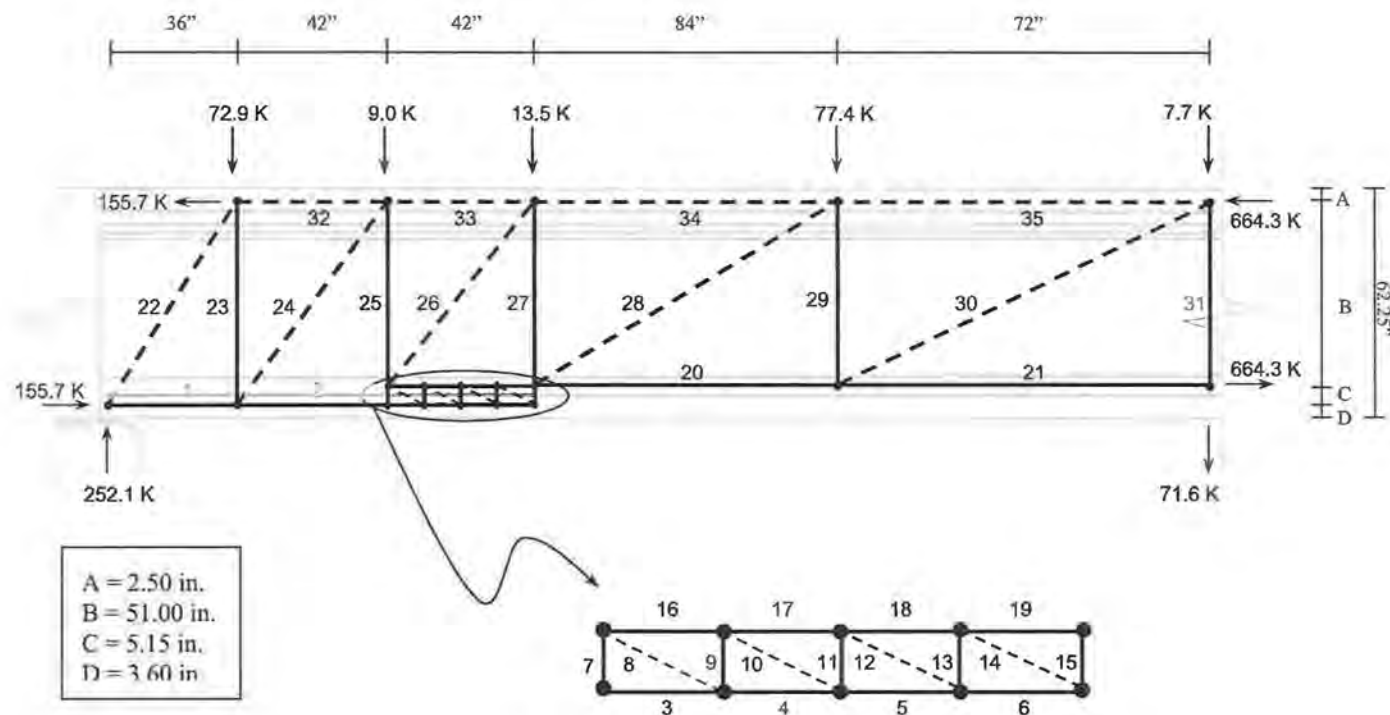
Strut-and-Tie Model of Cracked End Region of a Girder Made Continuous for Live Load with an Internal Hinge at the Cracked Cross Section (Model C)
